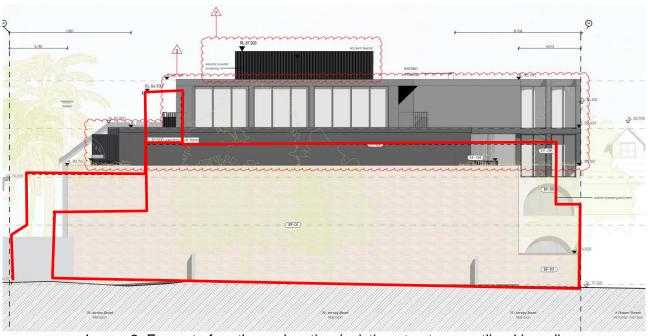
Excerpt of northern elevation (existing structures outlined in red)
